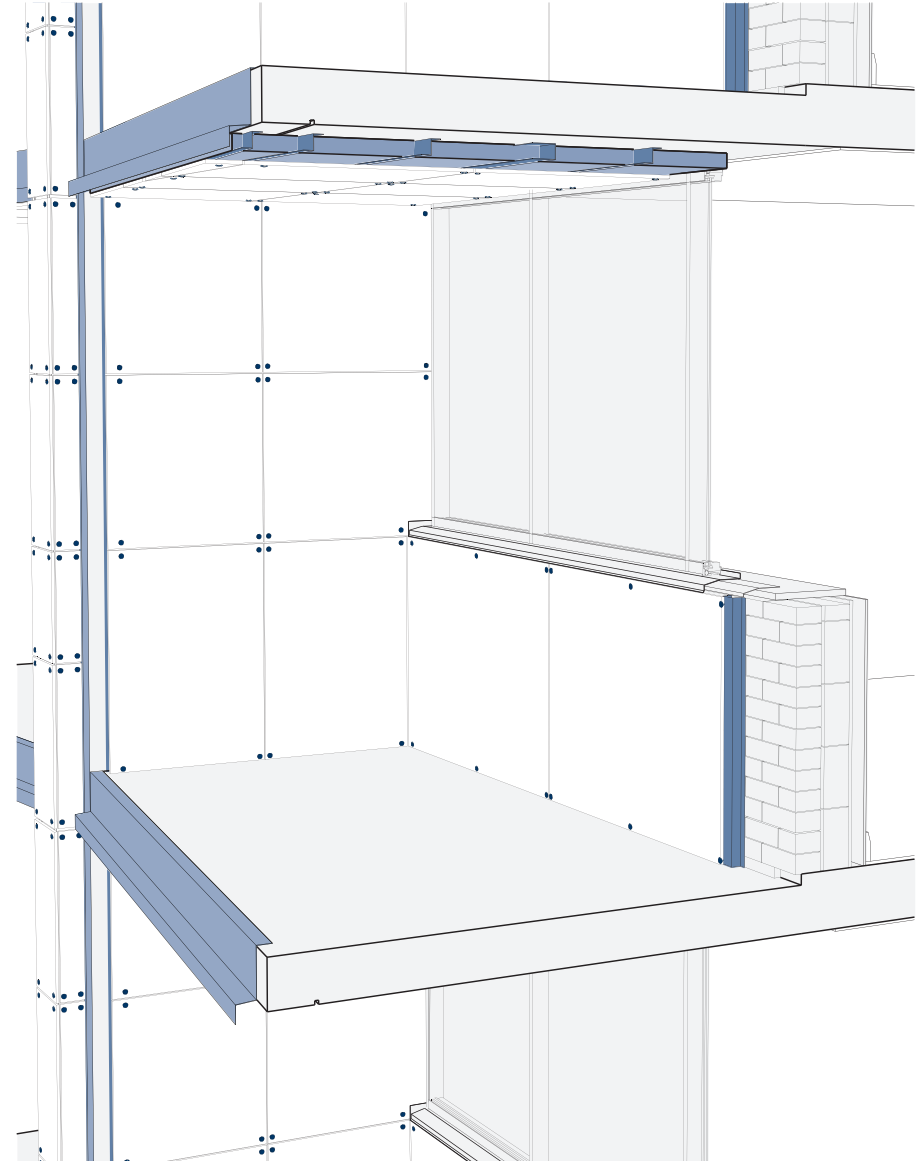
The panel cladding is installed as an interior finish (optional). Note that a pre-fabricated sill flashing extension will be required at the bottom of the existing window sill to transition to the panel cladding.
